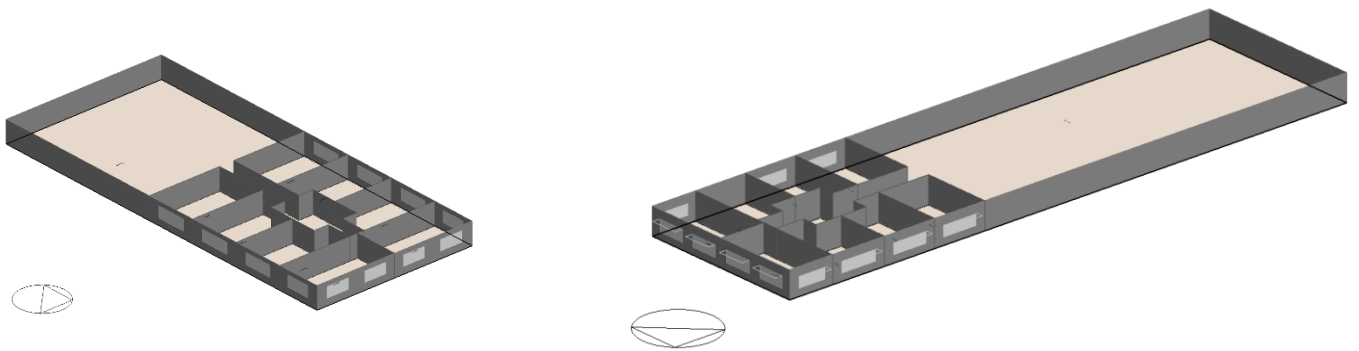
Designbuilder floor plans of the lower (right) and the upper (left) floors
